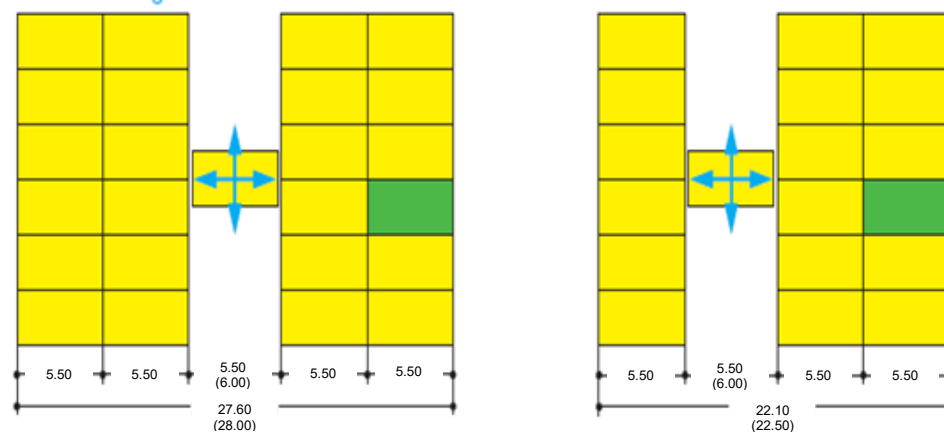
ROBOTIC PARKING SYSTEM PLAN
